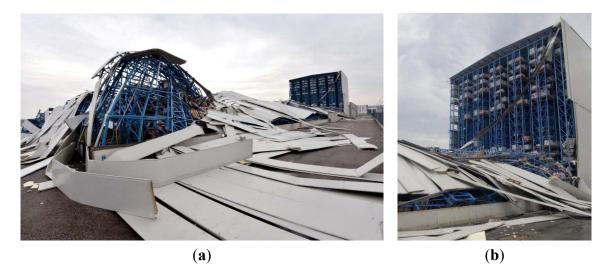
Storage building with internal braced steel scaffolding system: (a) Global view; (b) Failed connection of steel brace.
